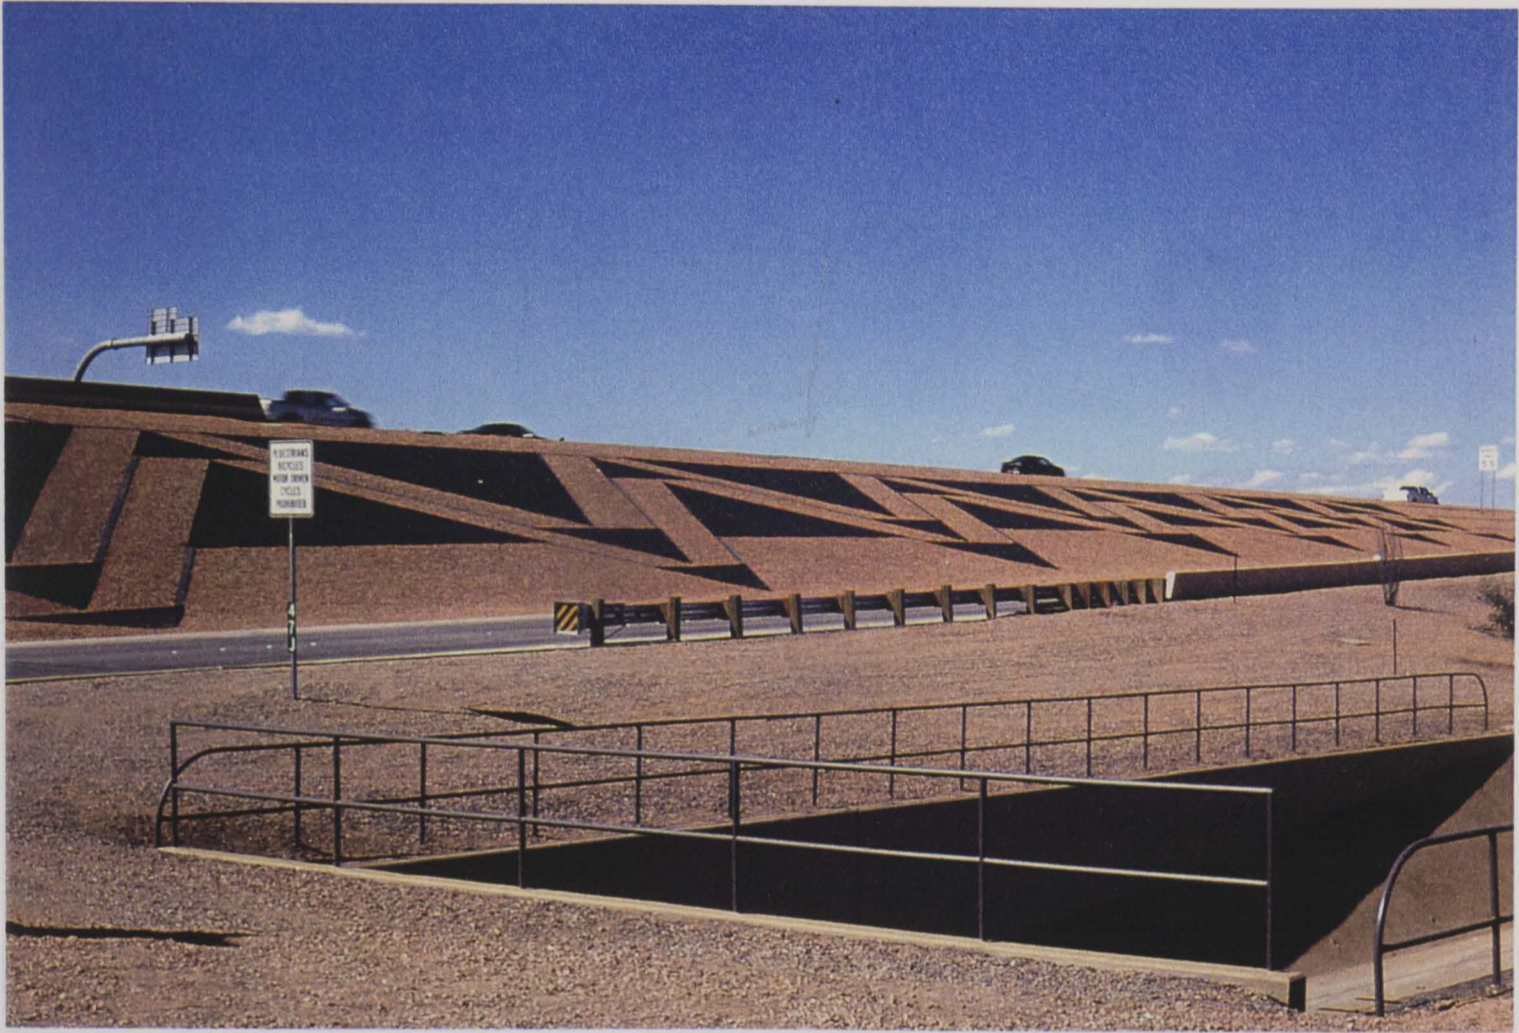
& 75: Pima freeway retaining walls in Scottsdale
